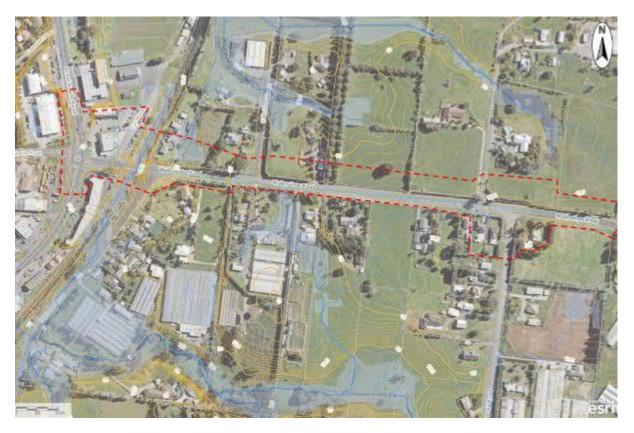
Extent of works - Waihoehoe Road West FTN Upgrade
